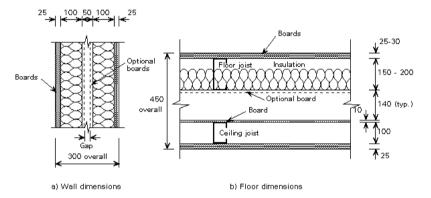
Typical Wall and Floor Dimensions (SteelConstruction.info, 2012).
